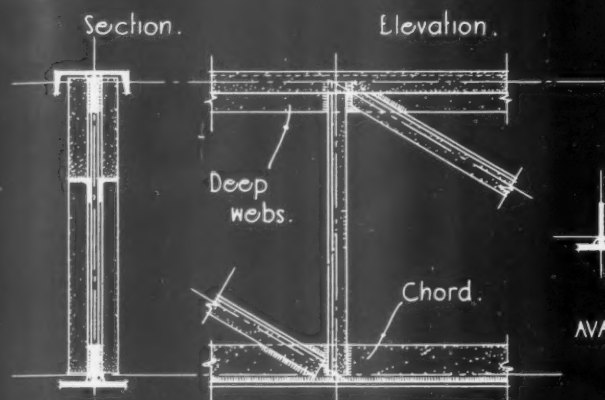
TYPICAL ARRANGEMENT OF PARALLEL TRUSS.
